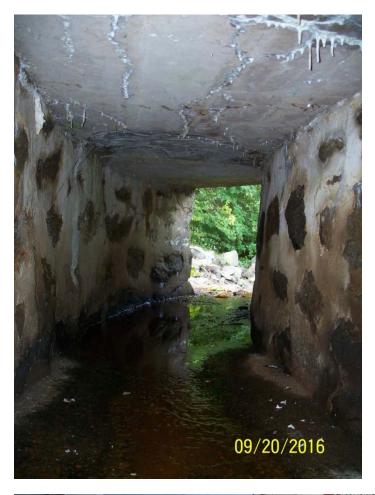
The interior roof of the spillway discharge tunnel. There are cracks in this section, downward bulging and pitting further along near the downstream end.
